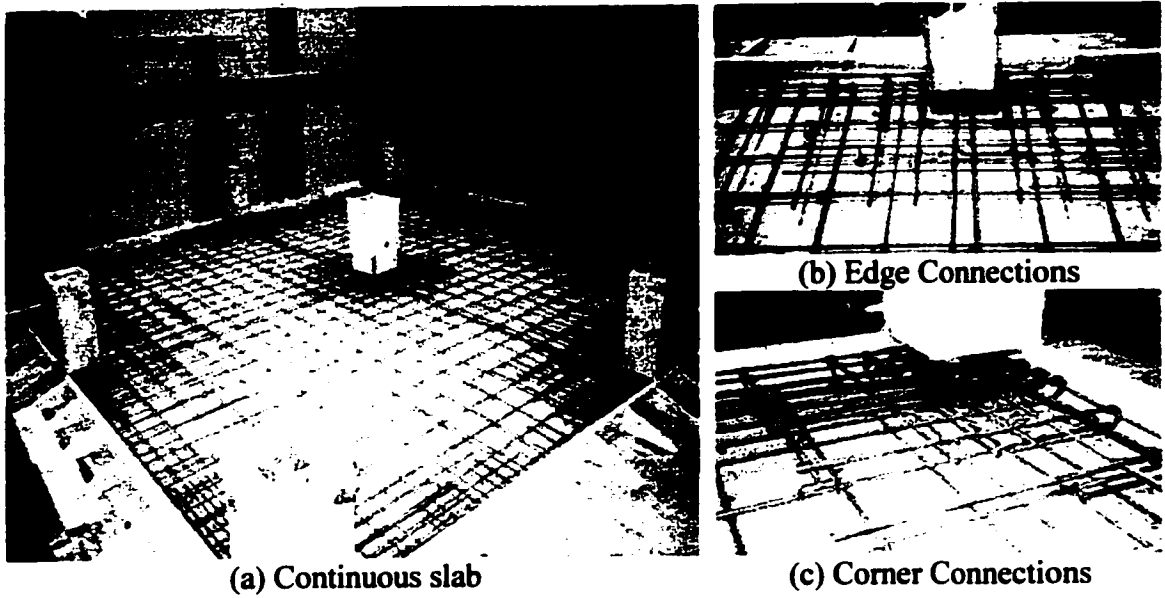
Field lay out of slab reinforcement; (a) overall specimen, (b) edge connections, (c) corner connections
